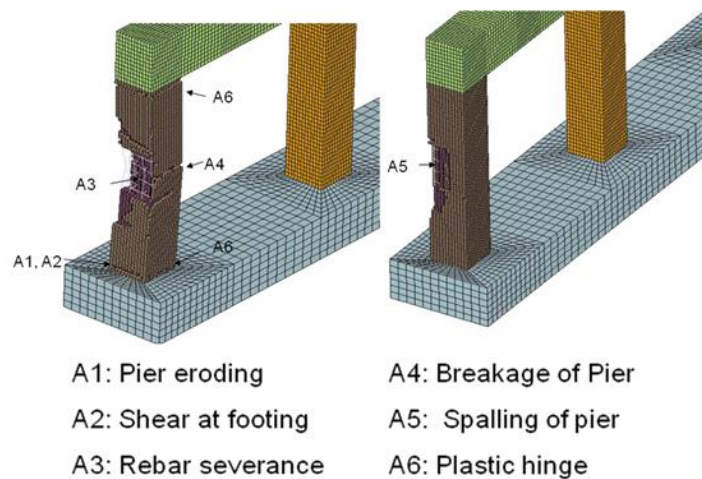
Photo. Damage modes present during impact of single unit truck with bridge piers.
